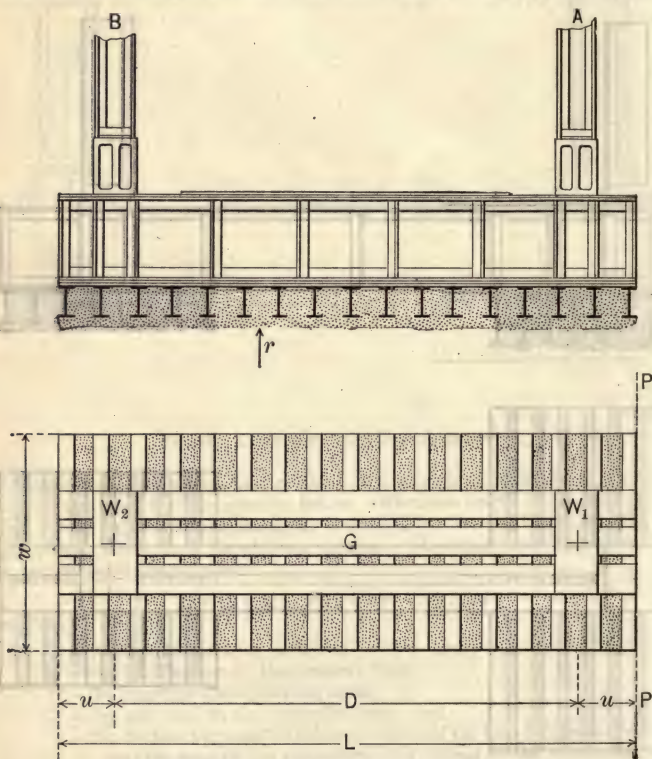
Girdering-method of Foundations. Two Equal Loads
